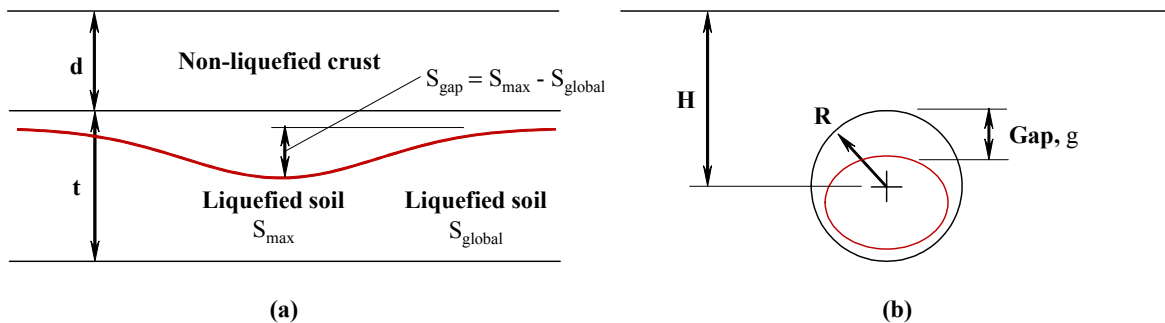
Parameters for estimating ground surface deformation due to (a) reconsolidation settlement and (b) tunnel construction.
